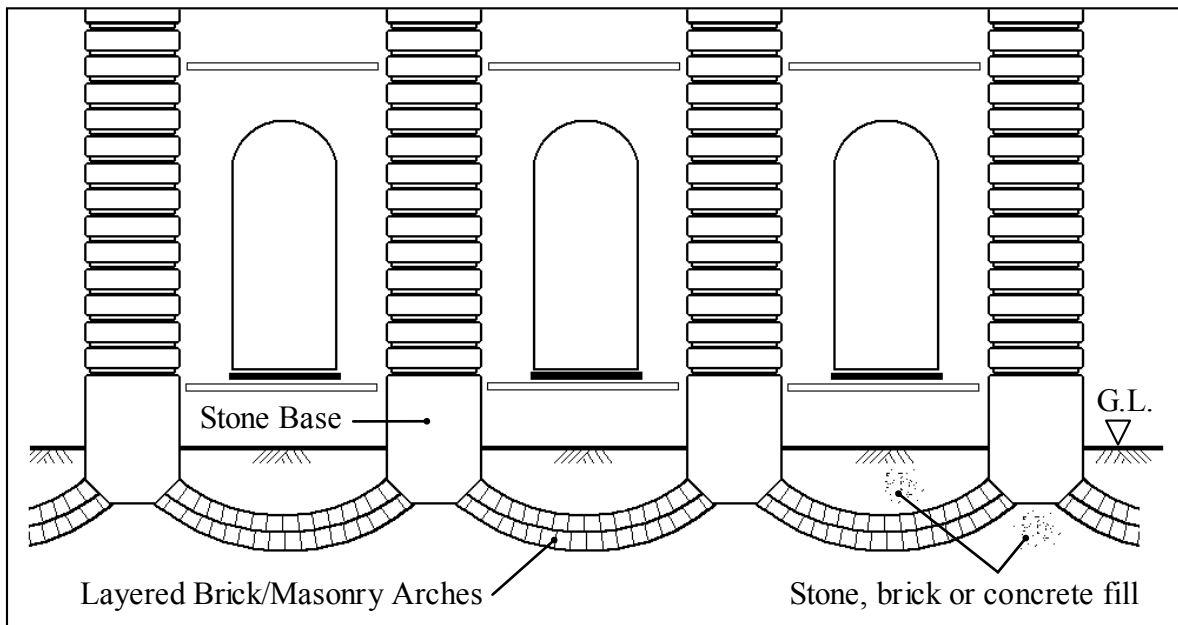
Inverted Masonry Arch Foundations (Kidder, 1905).
